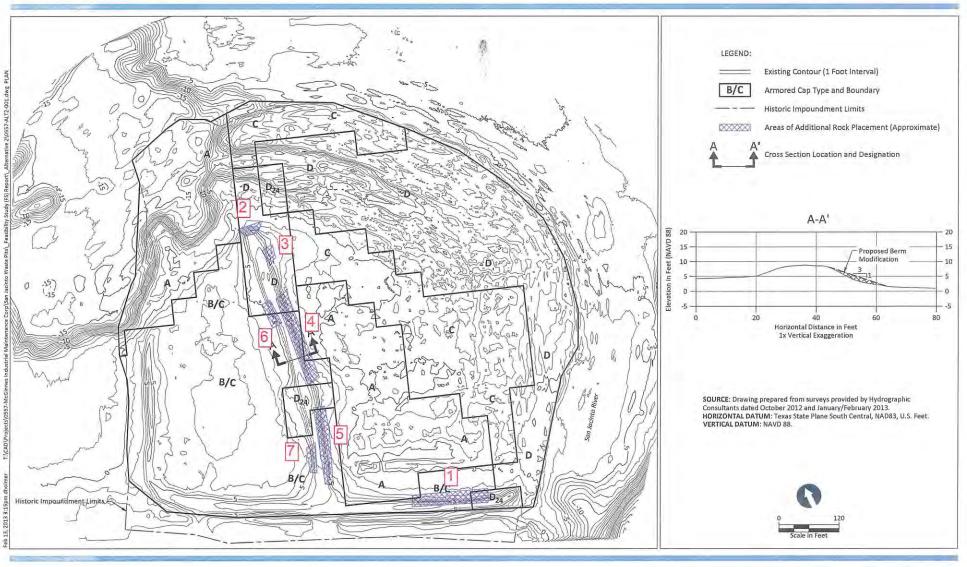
Additional Rock Placement Plan - Alternative 2 Post TCRA... San Jacinto River Waste Pits Superfund Site
